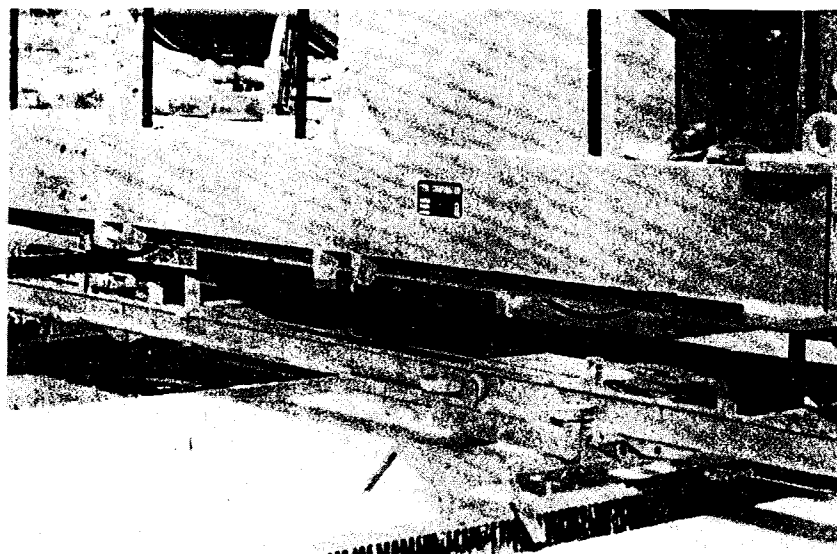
Finishing Machine Applying Transverse Broom Finish
